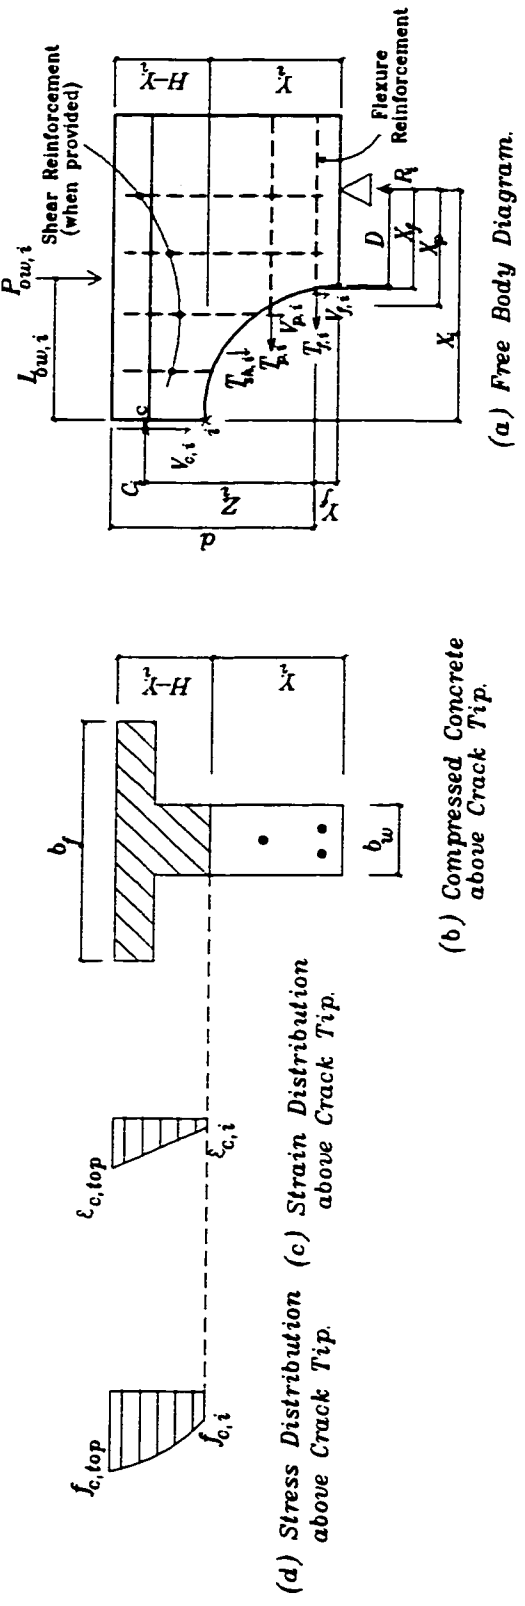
Failure Mechanism of Reinforced and/or Prestressed Concrete Beams.
